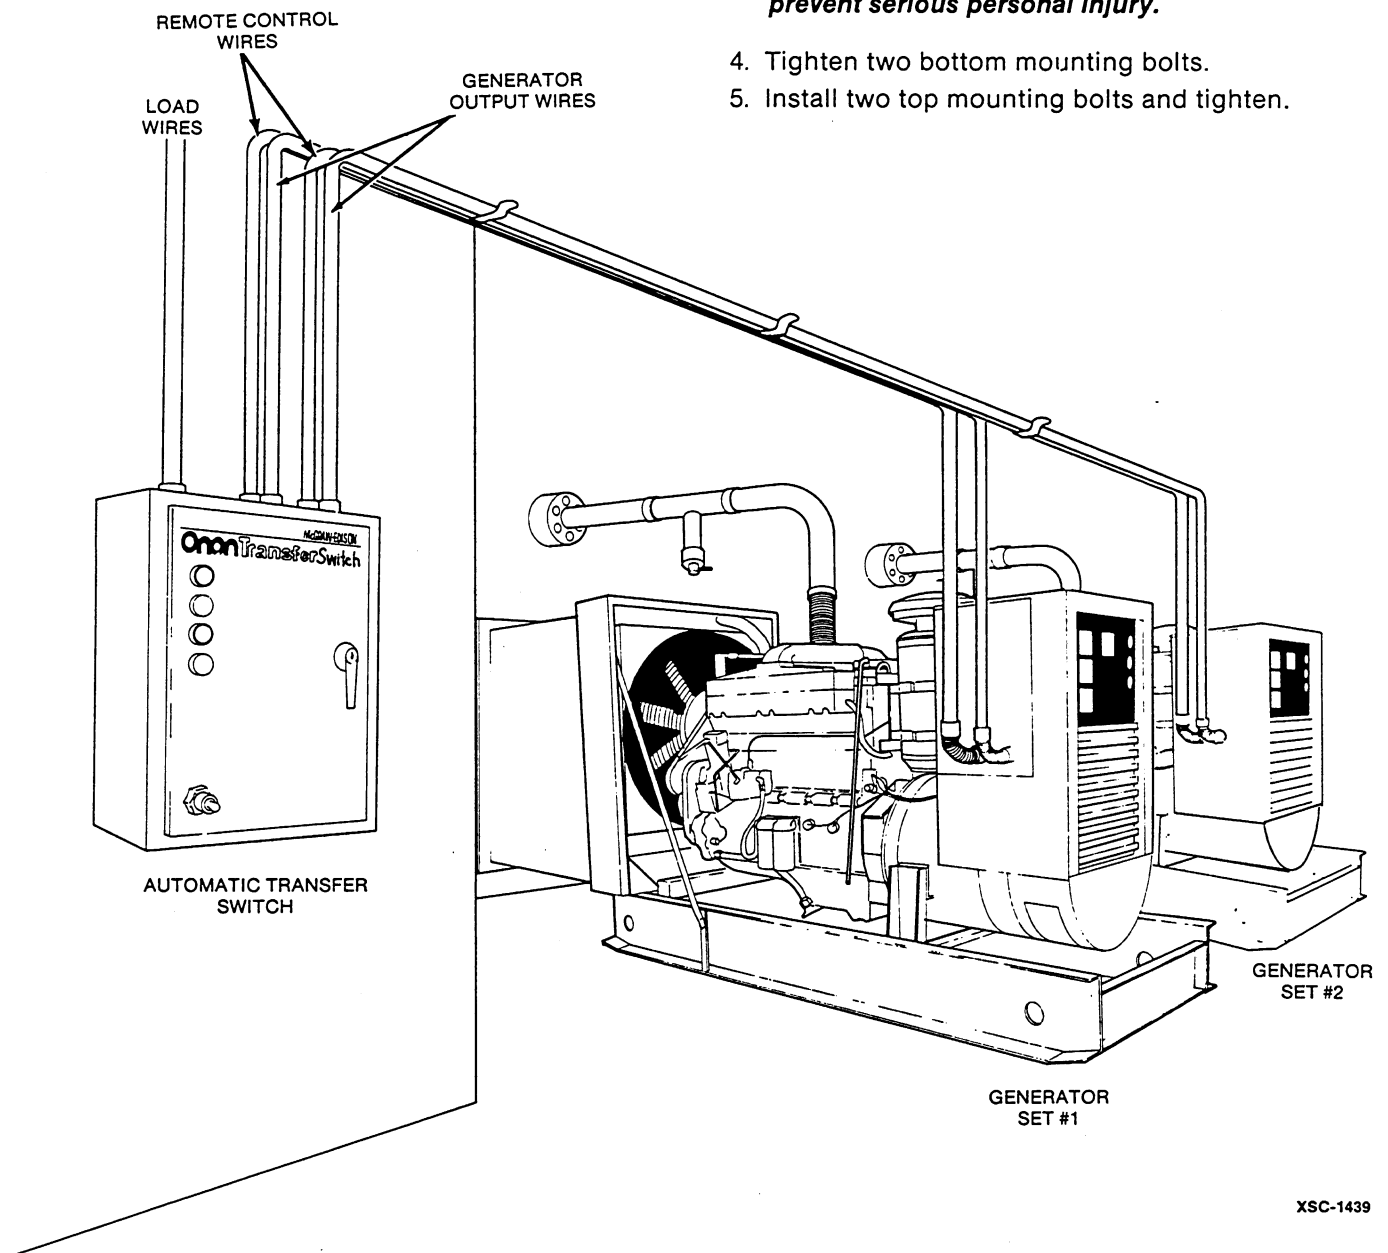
TYPICAL WALL MOUNT INSTALLATION
